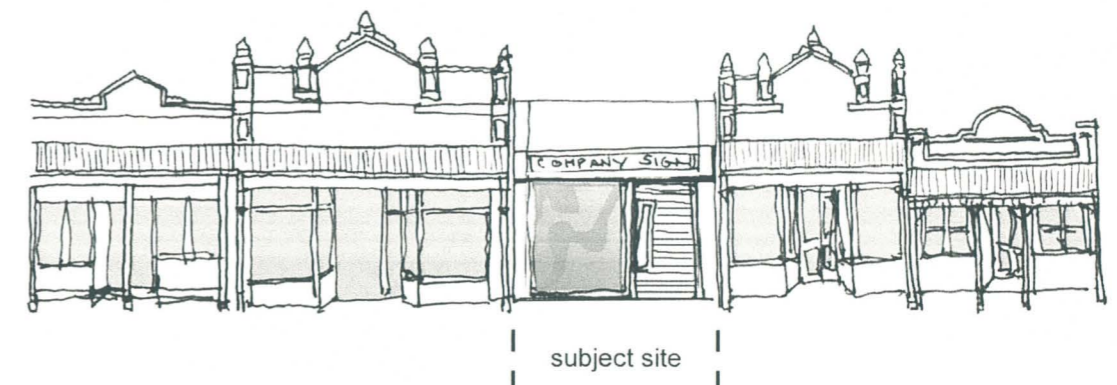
A bad example of infill where reflective glass on the infill building detracts from the adjacent heritage buildings. The window patterning of adjacent heritage buildings has not been considered, the entry is not recessed and the floor to ceiling glass on the ground floor is inappropriate.
